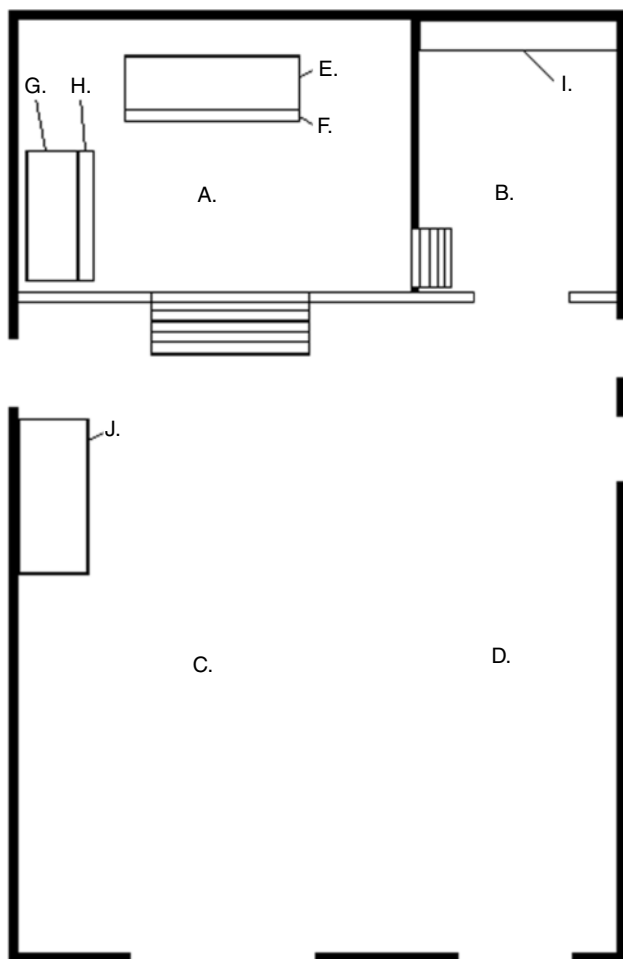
Diagram of the floor plan of the satsang hall, Shiv Shanti Ashram
